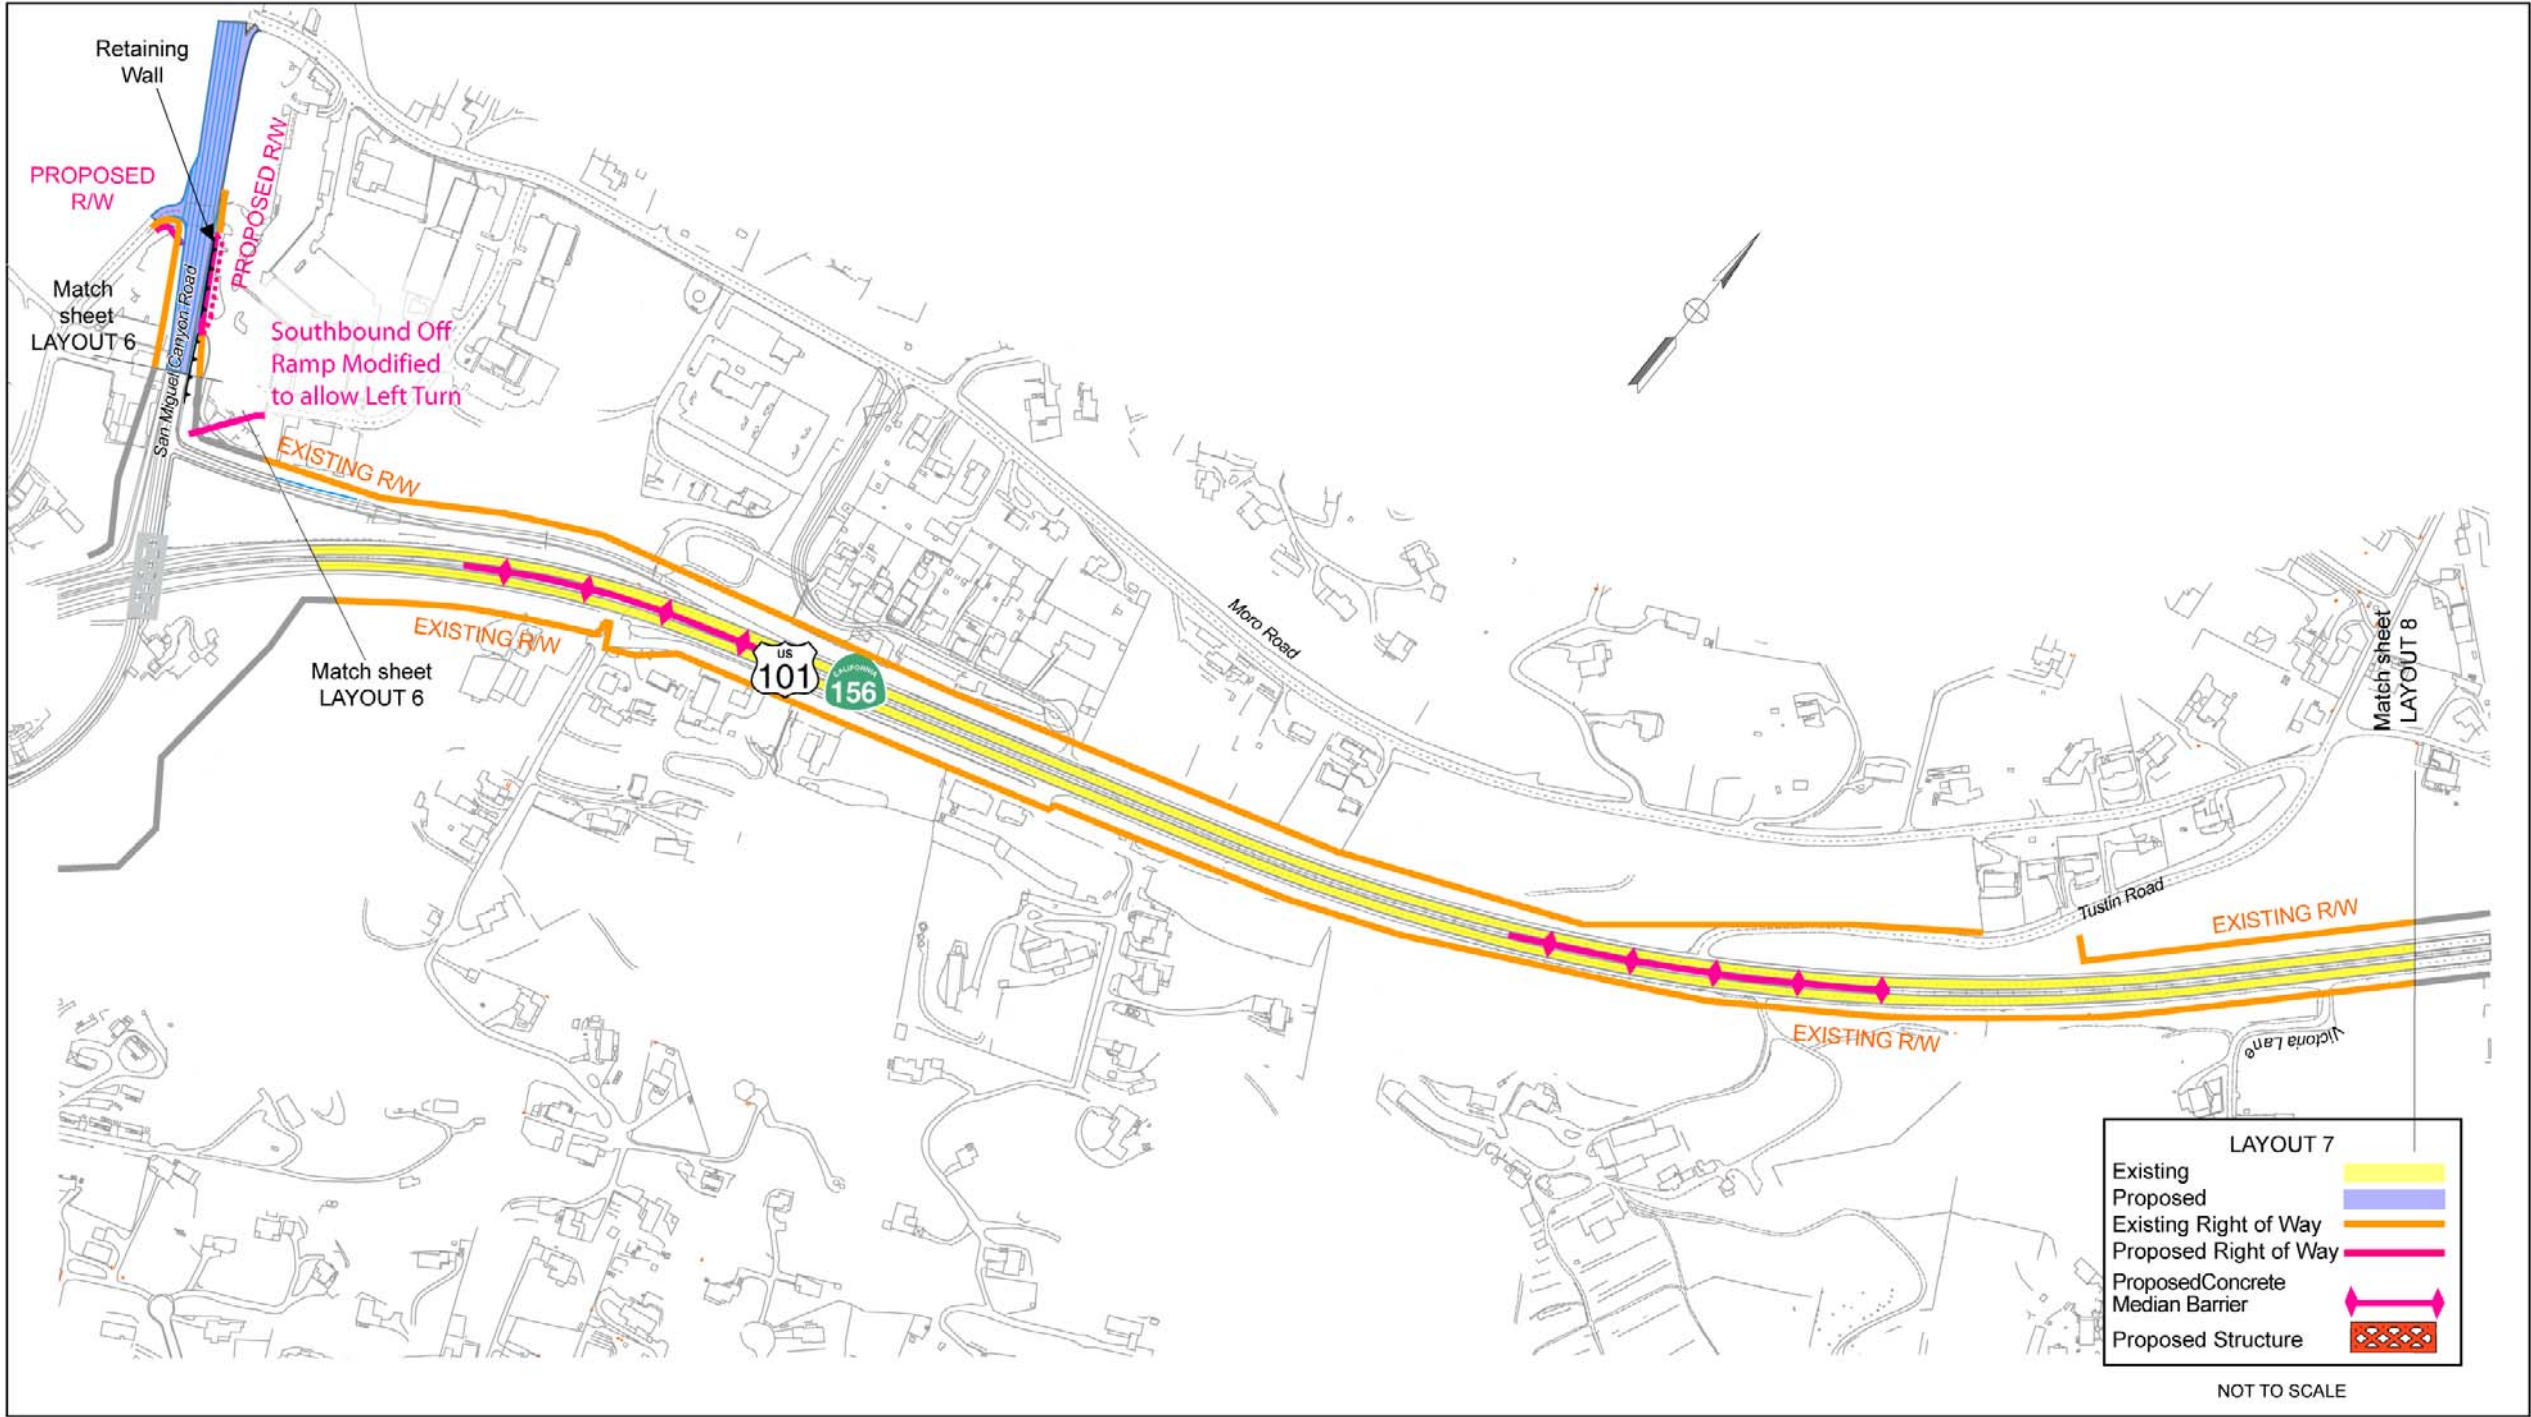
Build Alternative Design, San Miguel Canyon Road/Tustin Road Location
